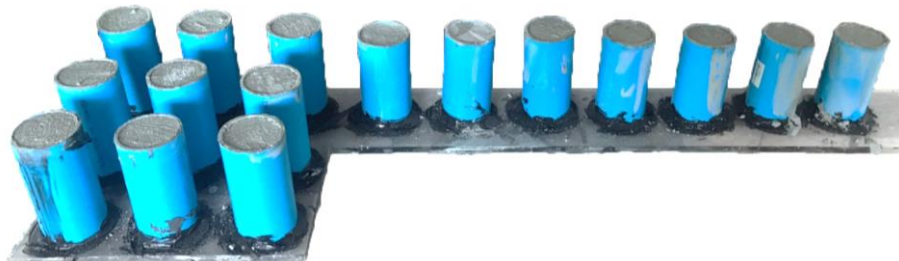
Casing grout specimen in PVC tube for compression test.
